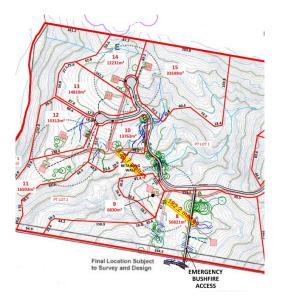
Distance between relocated dwelling site on proposed Lot 8.
